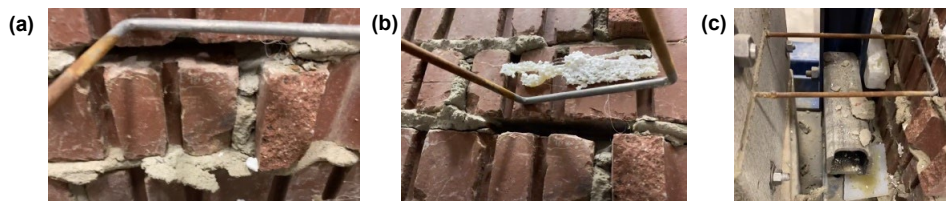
T-R.CL-1 after testing of (a) embedding failure, (b) horizontal mortar joint pull-out after connector removal, (c) top view after connector removal
